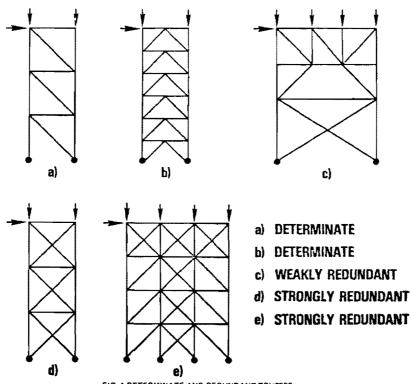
DETERMINATE AND REDUNDANT TRUSSES
